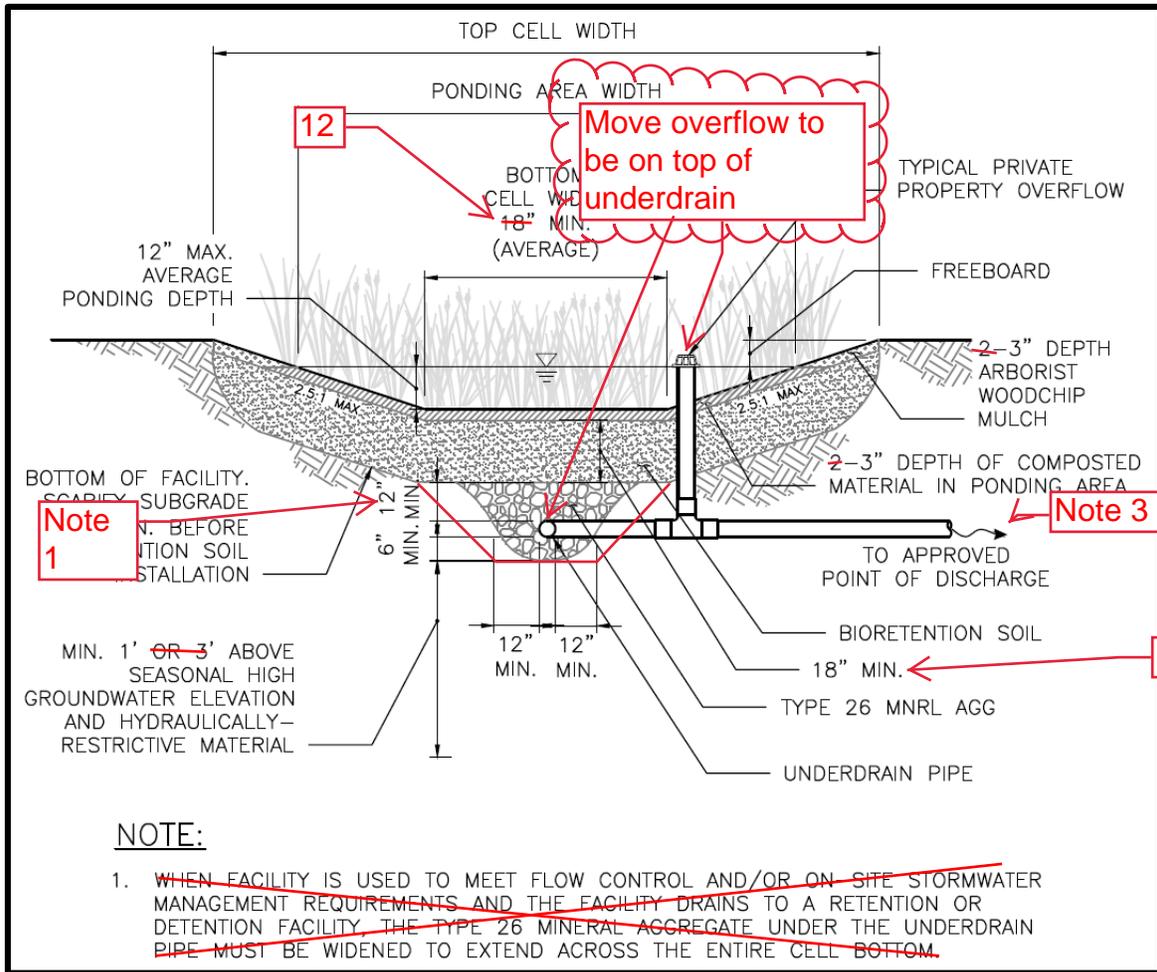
Infiltrating Bioretention Facility with Sloped Sides (with Underdrain).
